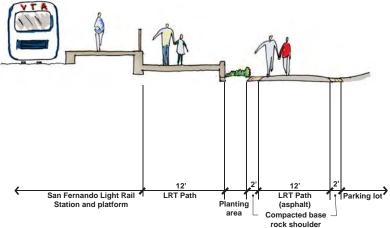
Section C: Ramp and path at San Fernando Light Rail Station Opportunities
